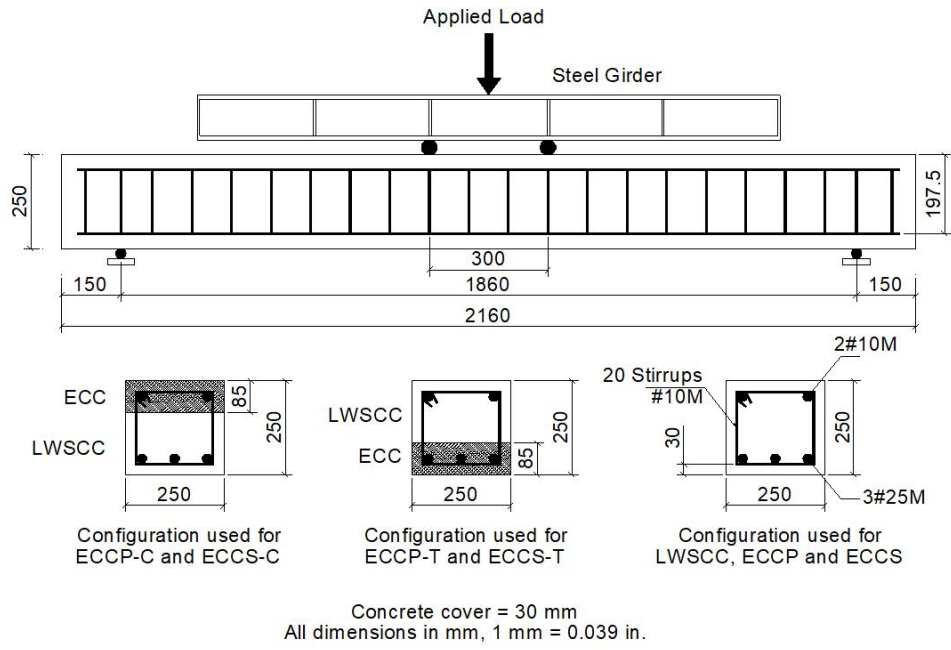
Geometry, reinforcement details, and test setup of the tested beams
